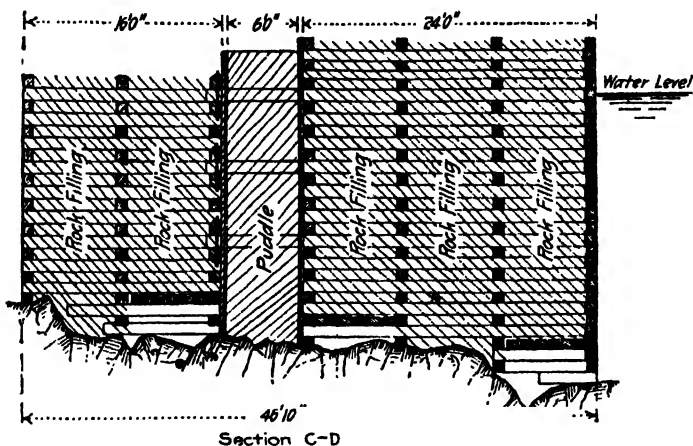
Typical Section of Crib Cofferdam. Niagara Power Plant, Electrical Development Co. of Ontario.
